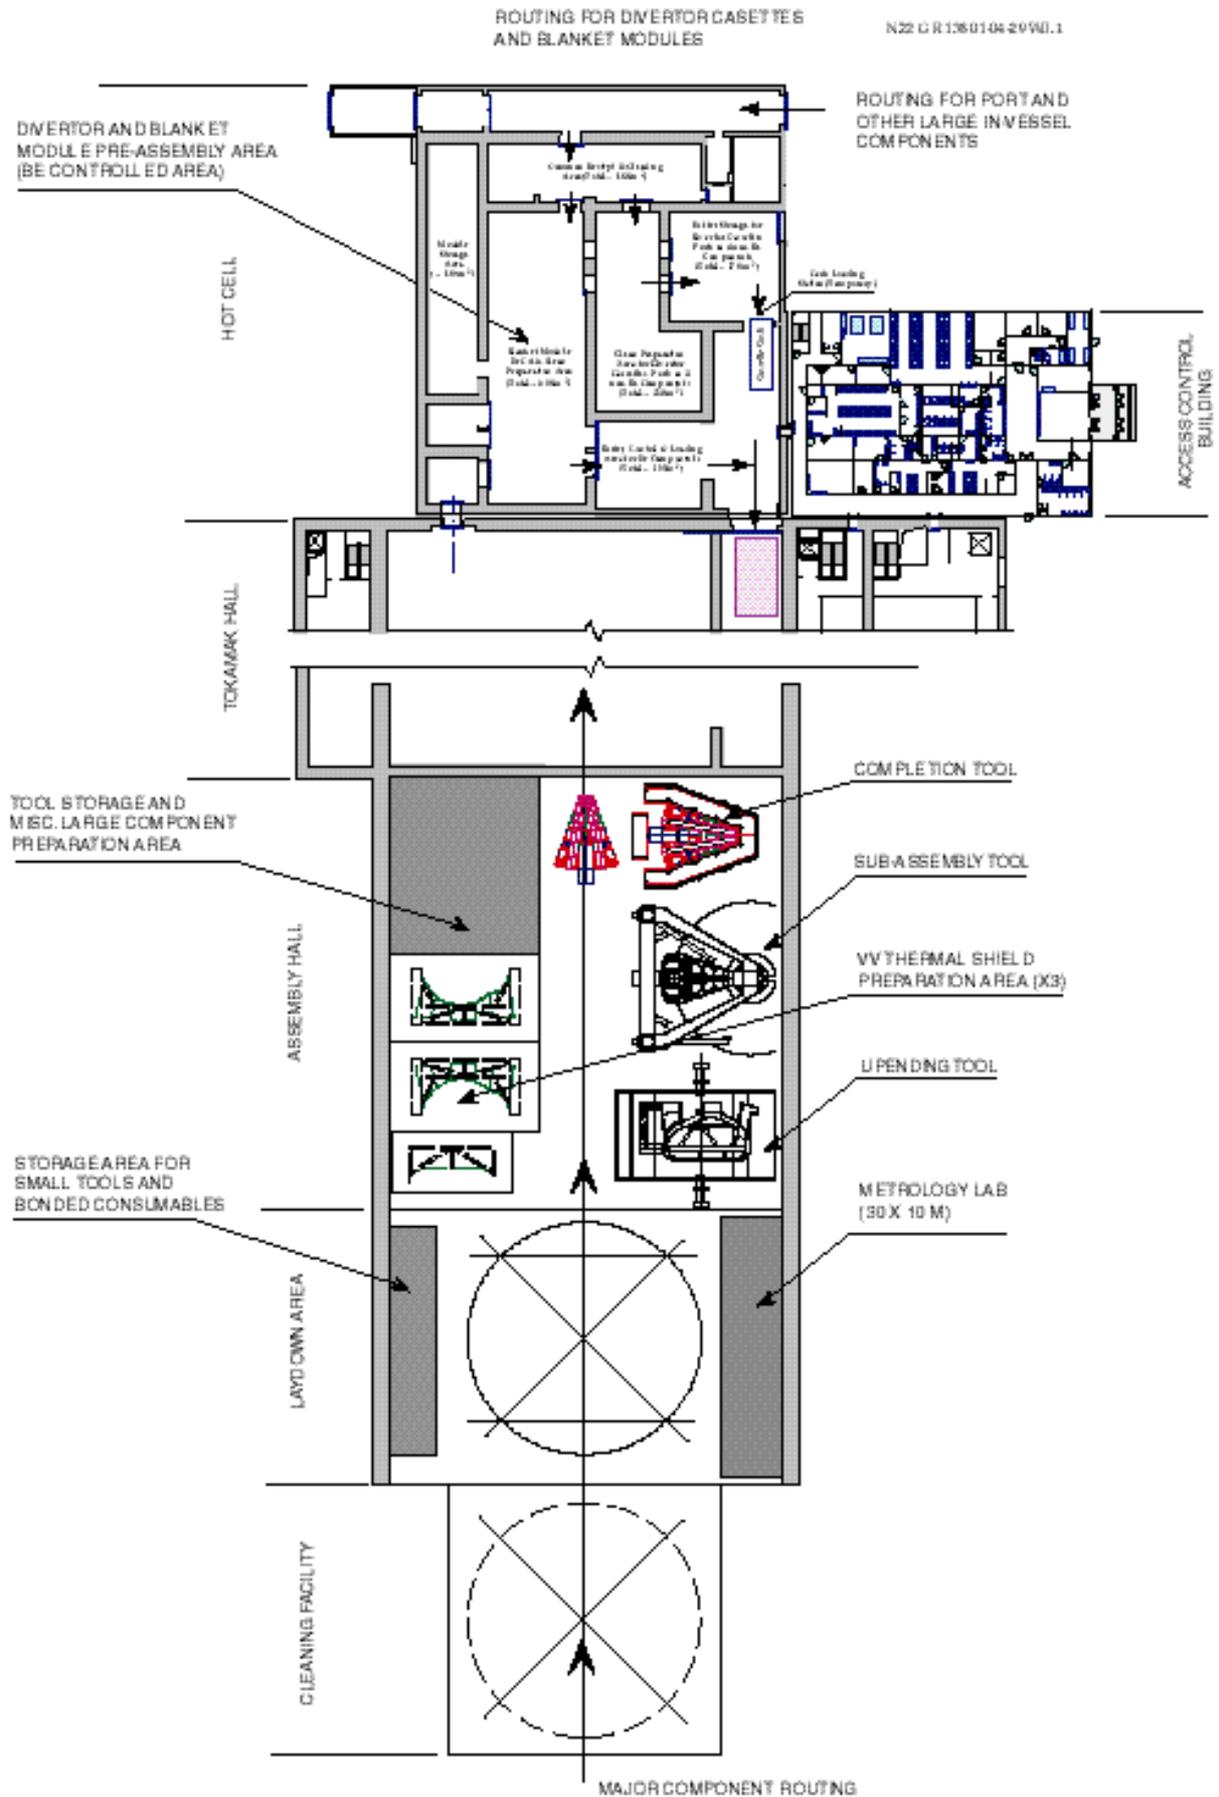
Utilisation of Tokamak Building during Initial Assembly
